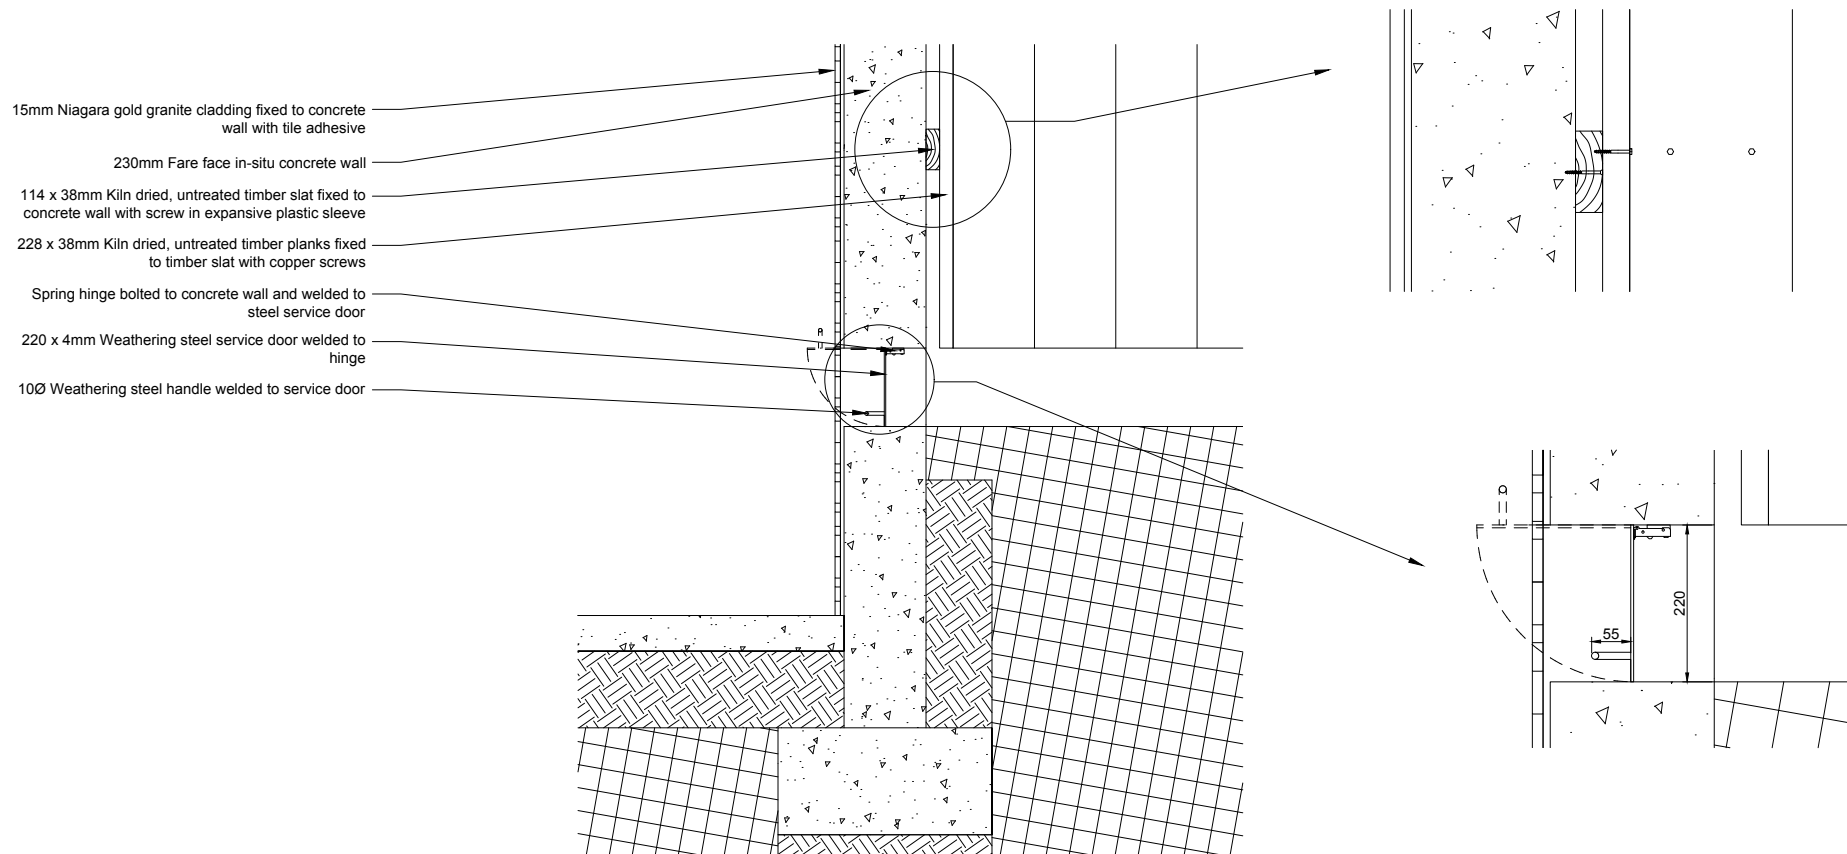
Detail 6: Composting chamber exterior wall detail (Author 2015).
